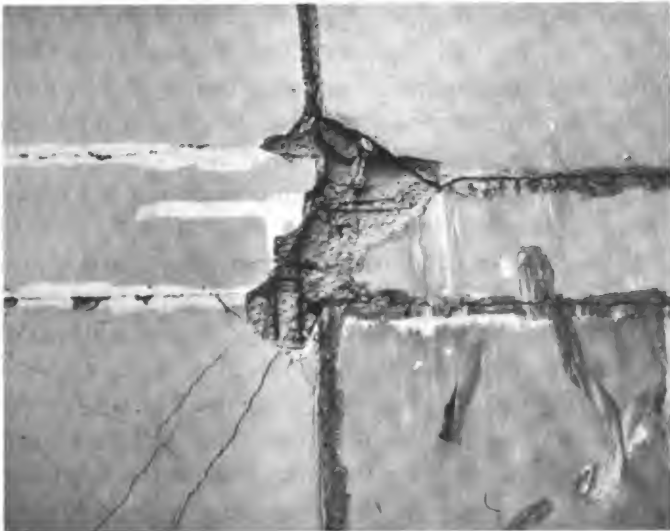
Pacoima Memorial Lutheran Hospital. Closeup of damaged joint at knockout panel at third floor, line 11. Paul Fratessa photograph.
